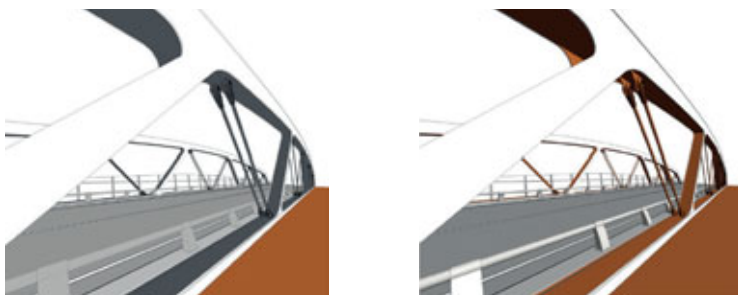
Evaluation of the effect produced by different colour schemes for the truss girders of the bridge (credit: © bEST Ingénieurs Conseils)
